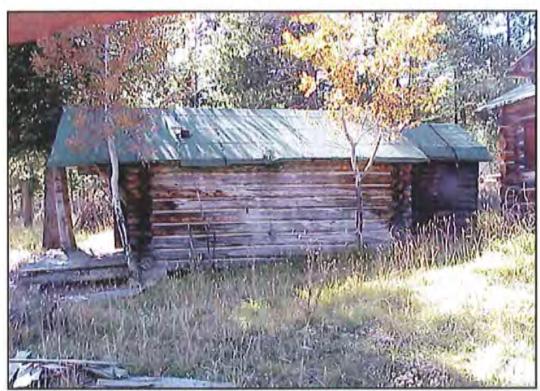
North wall of HS-1165, Cabin 5. Source: A&E Architects, 2004.
